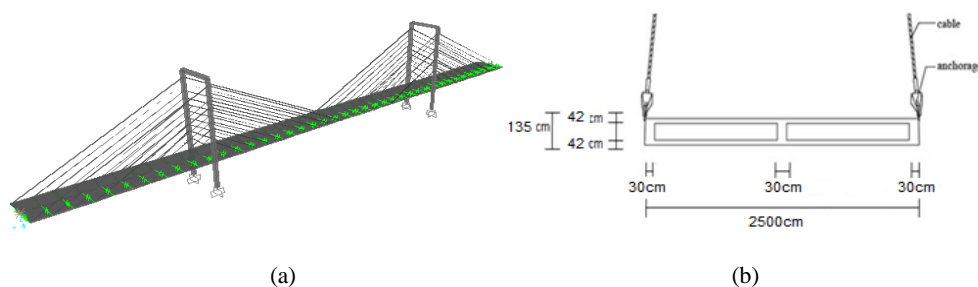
a) Finite element model; b) Dimension of concrete box deck
